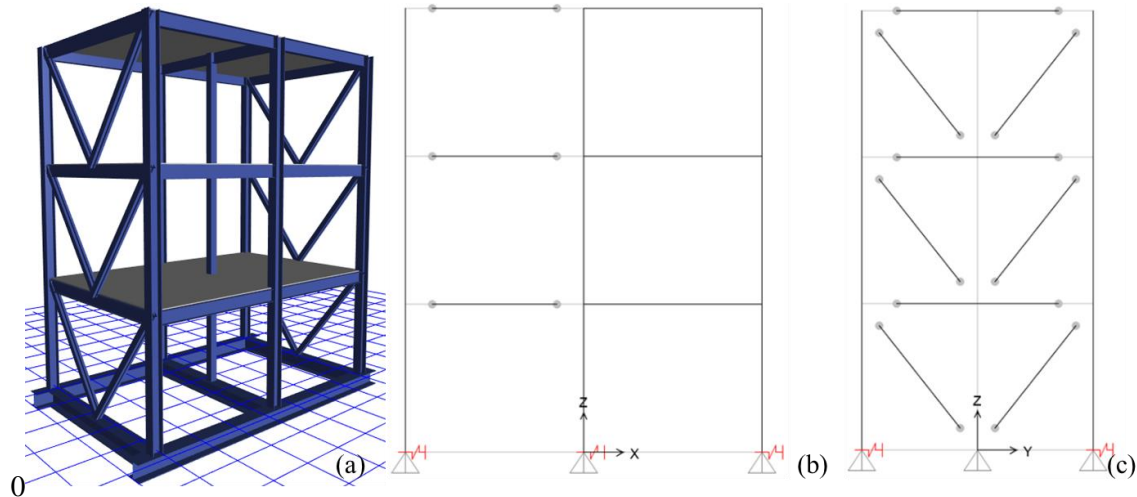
(a) 3D View, Elevation in (b) Long Direction and (c) Short Direction of Proposed Structure
